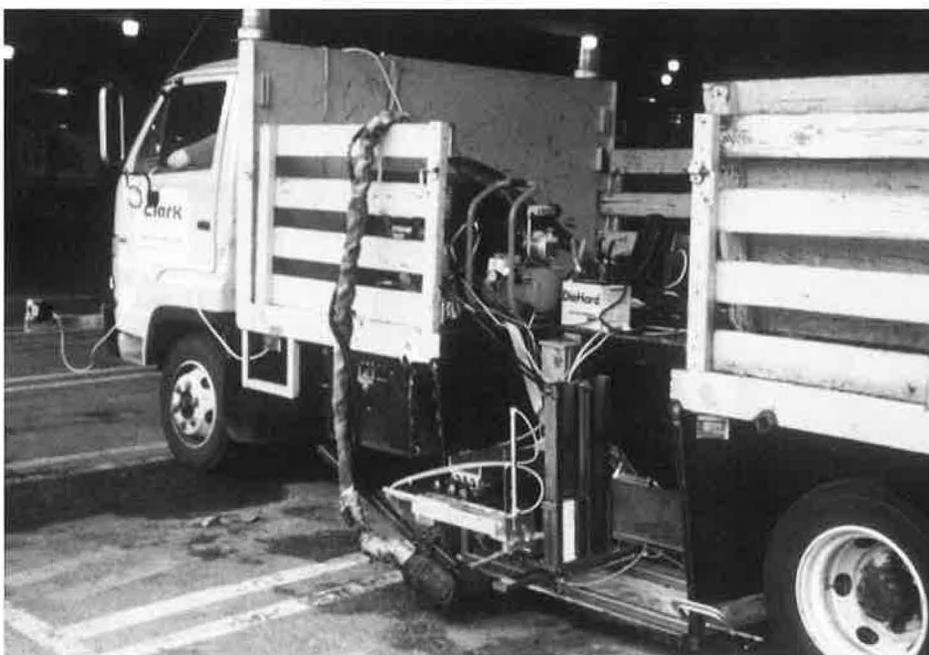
Installation of telerobotic raised pavement marker applicator on truck.
